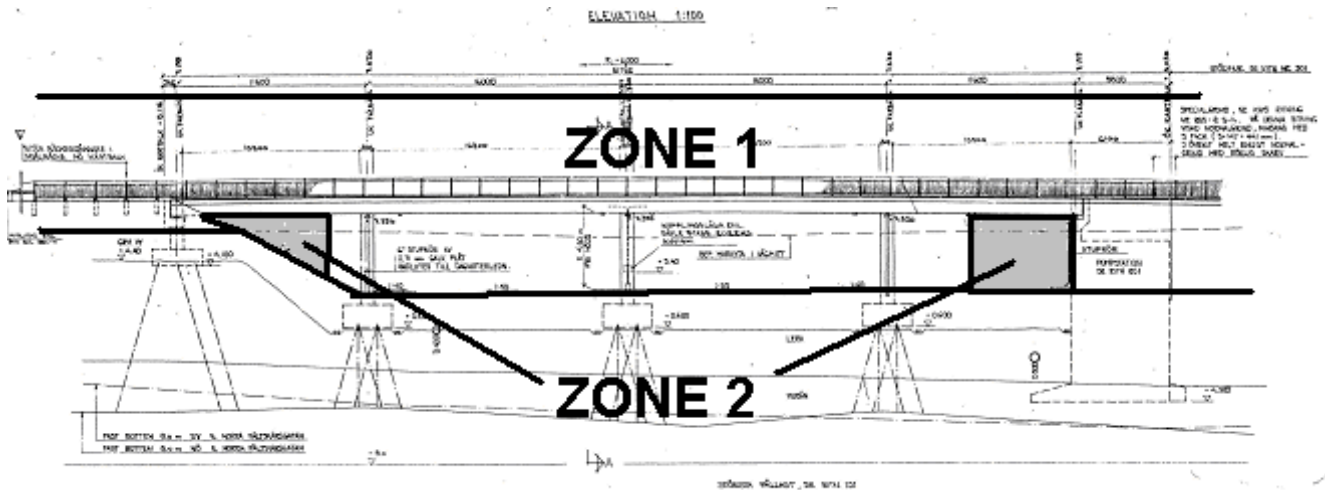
Division of exposure zones applied on the bridge at Faltskarsleden. As can be seen in the figure, zone 2 is located around the breast walls and partly the underside of the slab, all other parts include zone 1.
